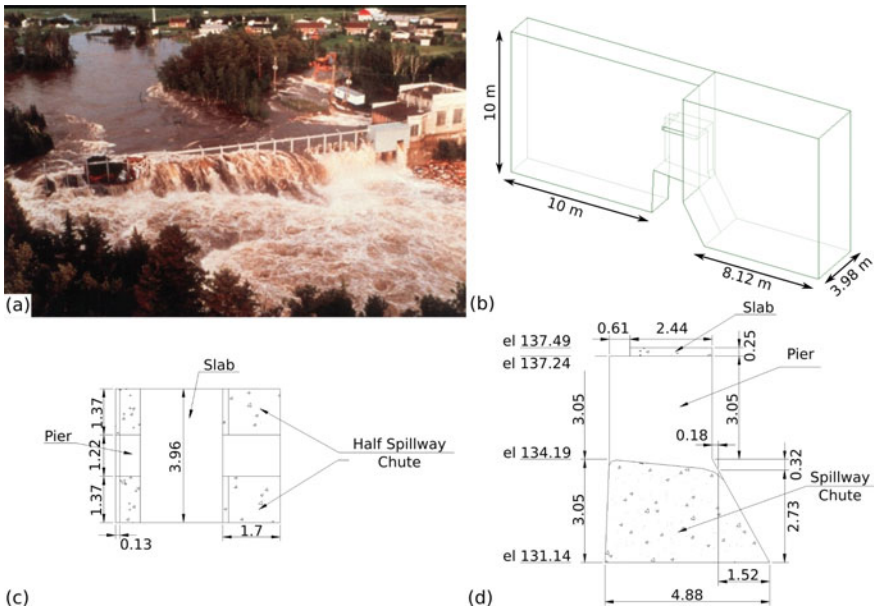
Chute Garneau: a 1996 Saguenay flood, b 3D model geometry, c plan view, d elevation
